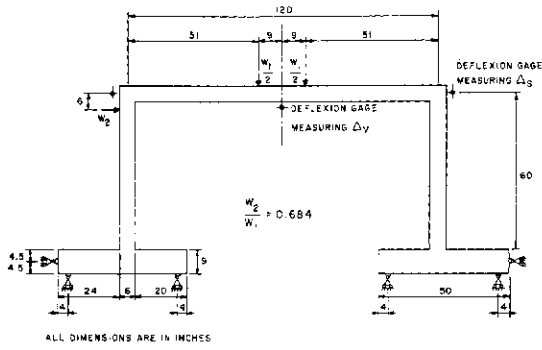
Dimensions and loading of frame FP4 (after Cranston and Cracknell [1]).
